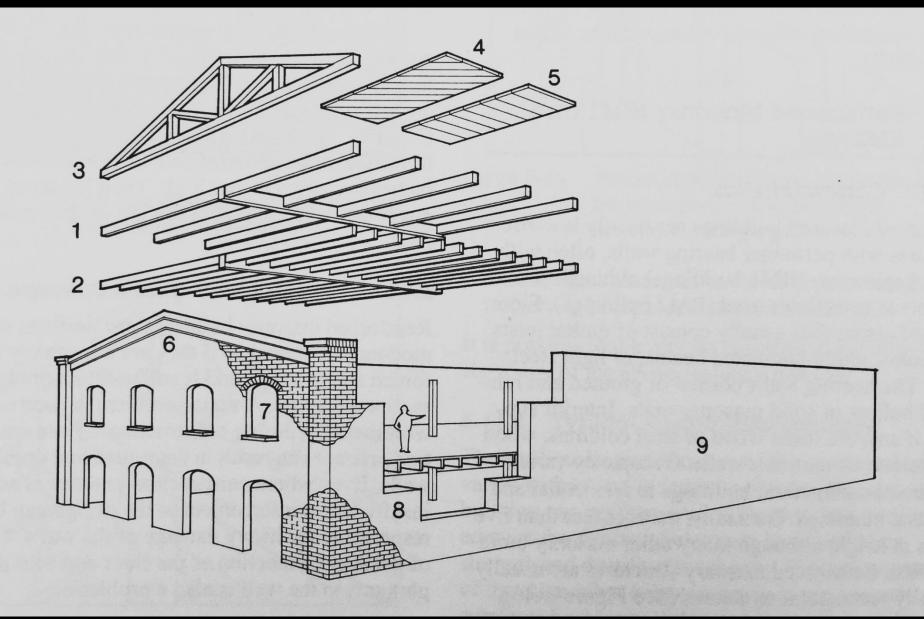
Key requirements for ensuring box action in a stone masonry building (adapted from: Murty 2005)
